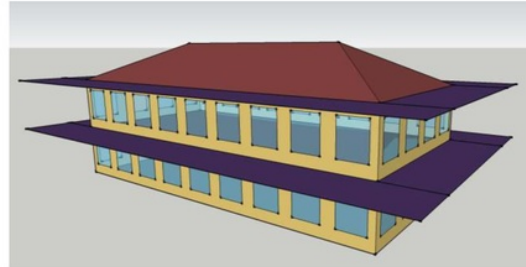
Colonial office building model with width of 3.6m sun shading and wall openings of 40%.
